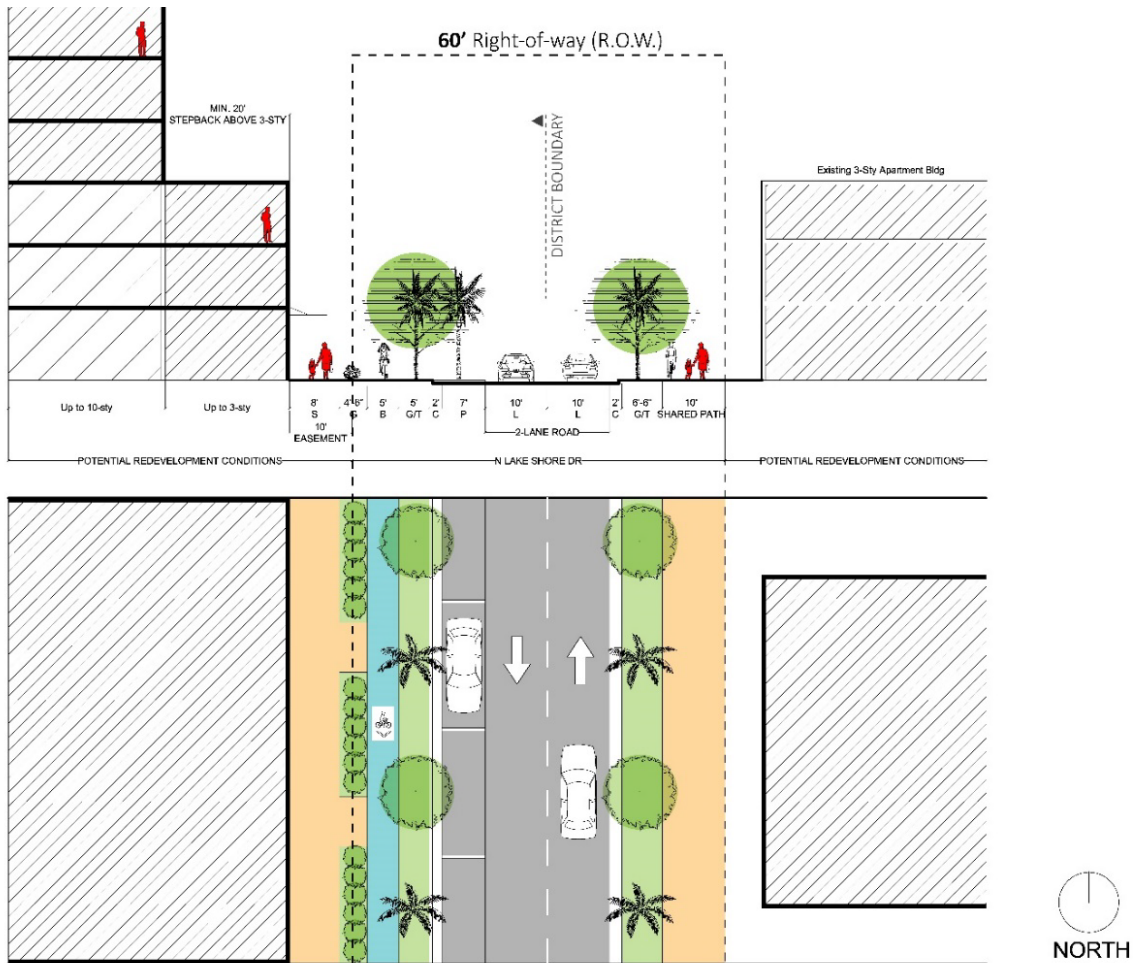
F.5: Lake Shore Drive (North of the Lake Park Harbor Marina) Street Design
